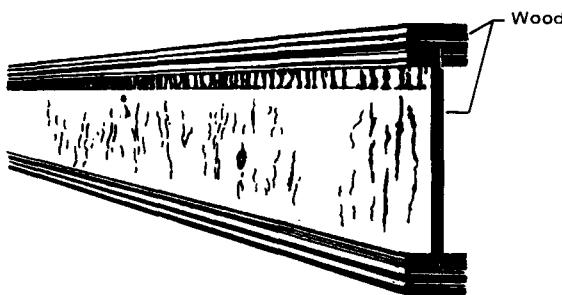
(a)(ii) Typical composite wood joist construction.
